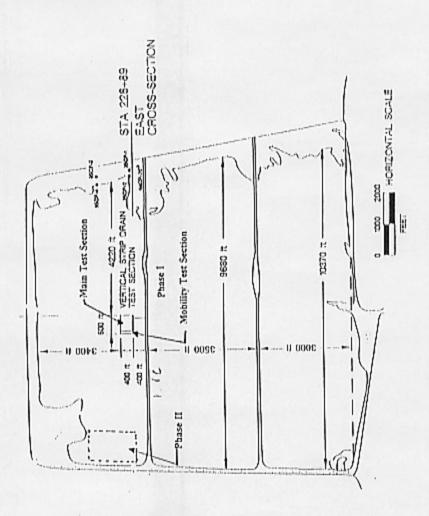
Plan View of Craney Island and Location of Vertical Strip Drain Test Section
